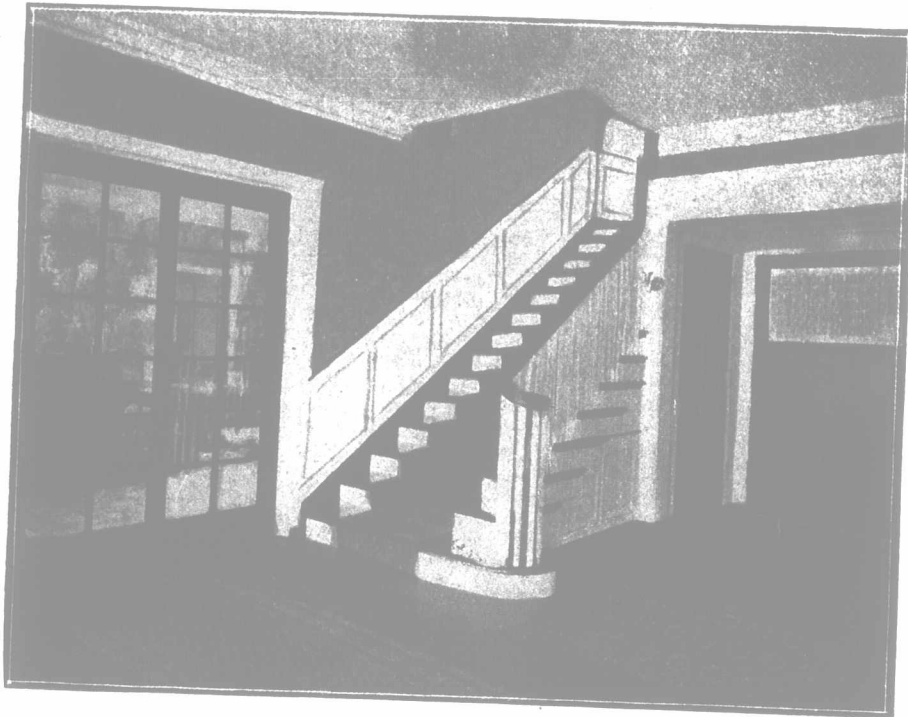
Glass doors between two rooms. A good plan for lighting a dark hall. Small fancy windows between room and room are sometimes used for the same purpose. (By permission of House Beautiful.)
